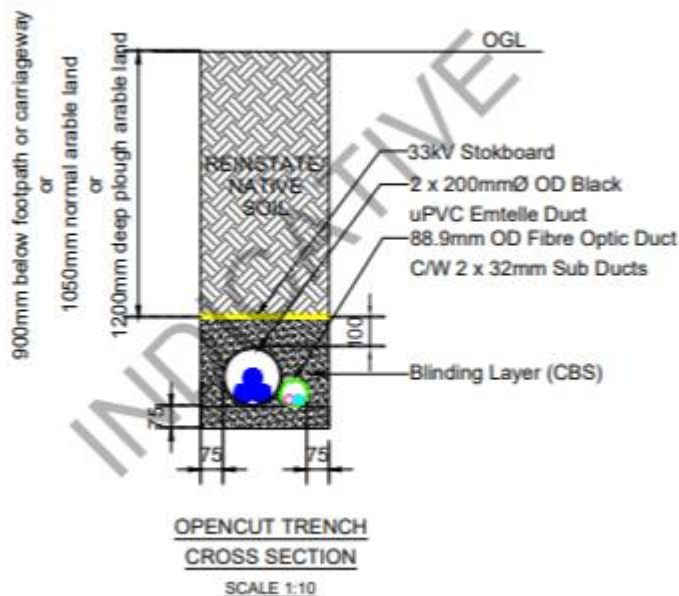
Excerpt from Indicative Cable Trench Cross Section
